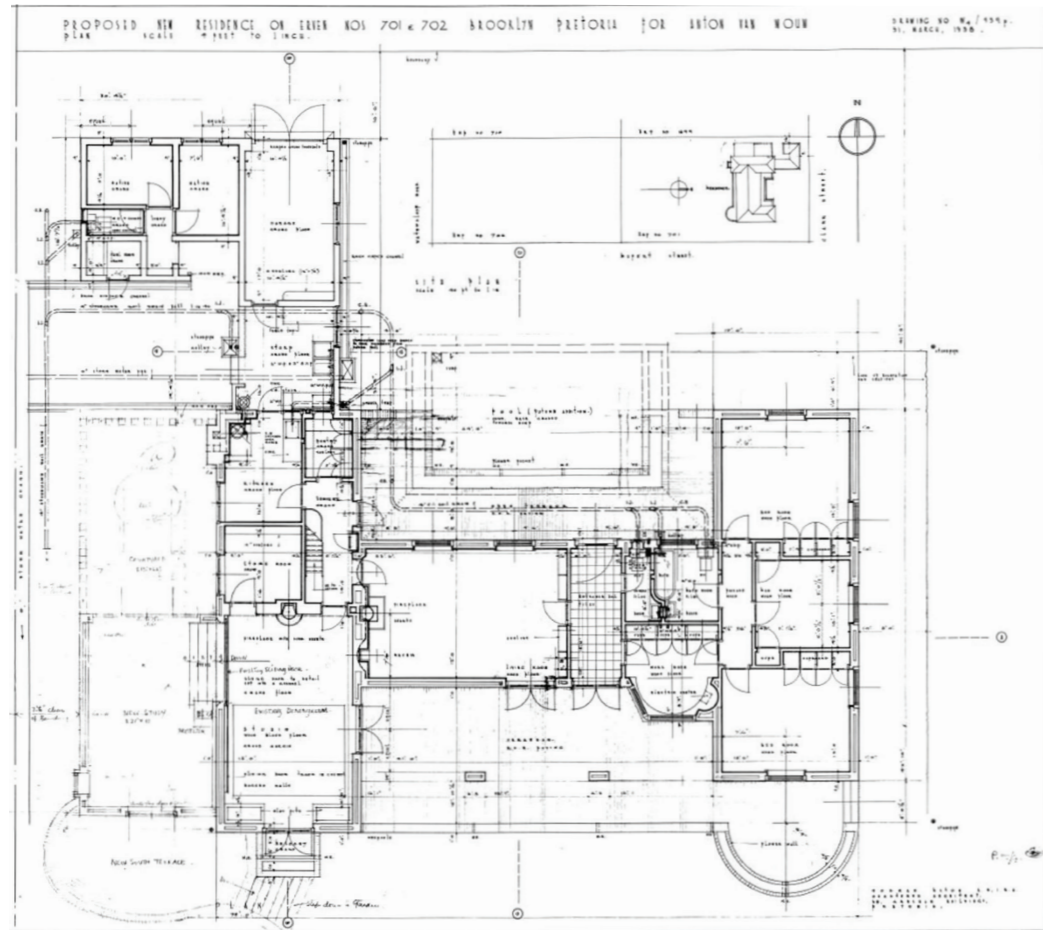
Anton van Wouw Huis plan (Unknown, n.d.)
